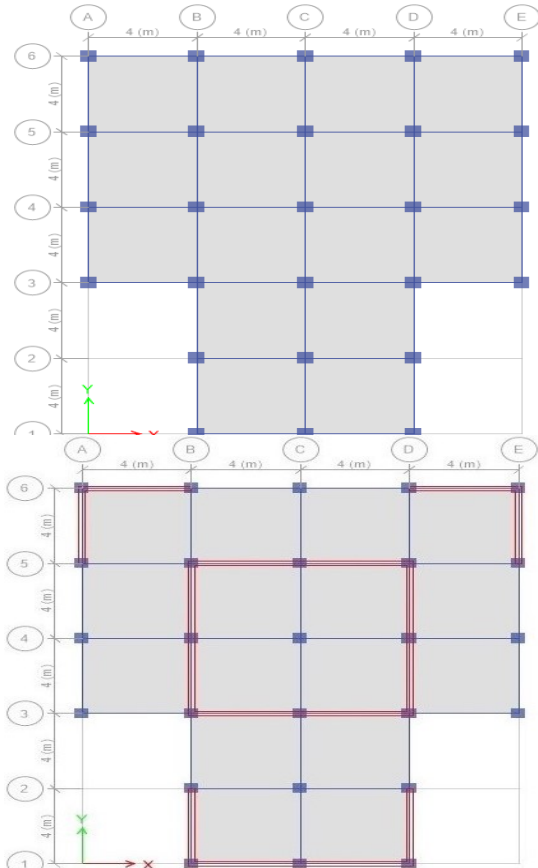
Plan of irregular structure T1 representing bare frame and frame with bracings and infill walls
